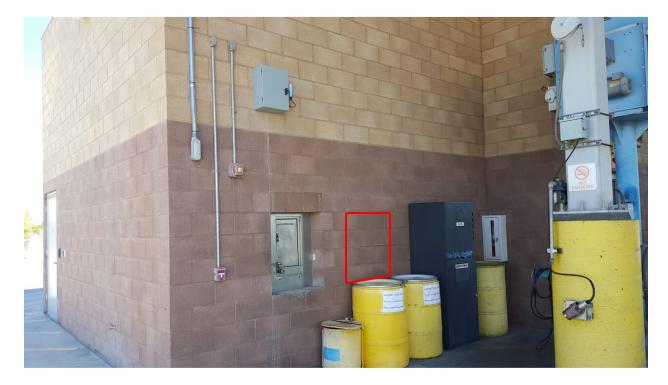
South Elevation of Coin Operations Building. Proposed new opening shown in red
